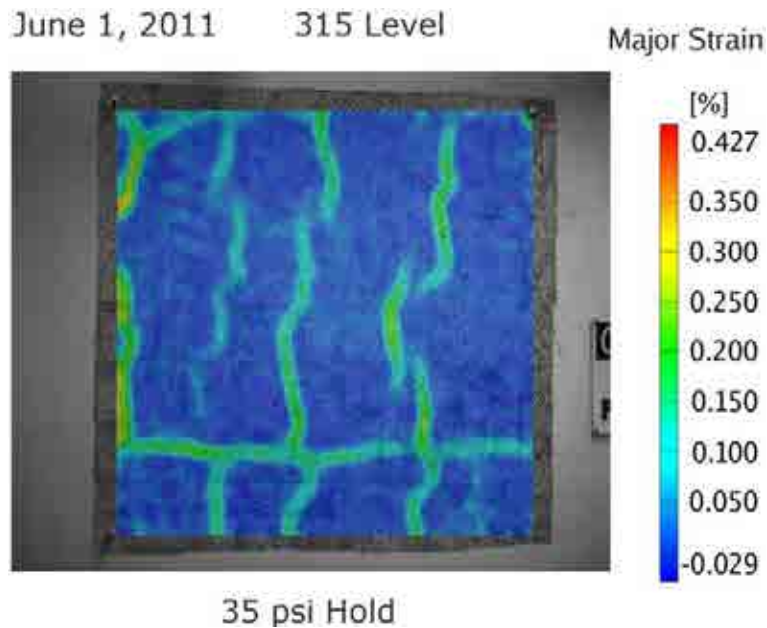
Digital image correlation principal strain overlay at a hold point. Significant strain 'fingers' are indications of hairline cracks in concrete surface [481].
